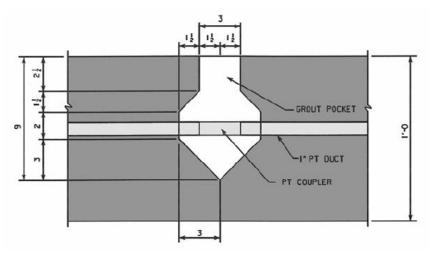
Longitudinal joint detail (Merritt et.al, 2007)
